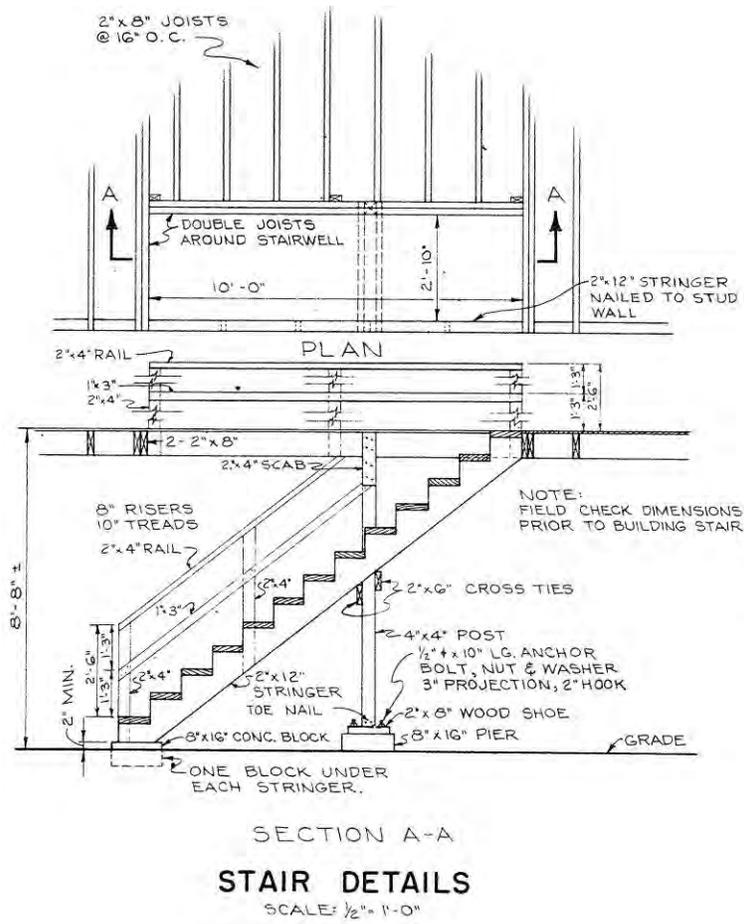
"Combat in cities" course type "B" building stairs details, 1952 (standard drawing 28-13-01 sheet 4 of 9; "Combat in cities" course, type "B" building, plans, elevations, and details; 20 June 1952).
